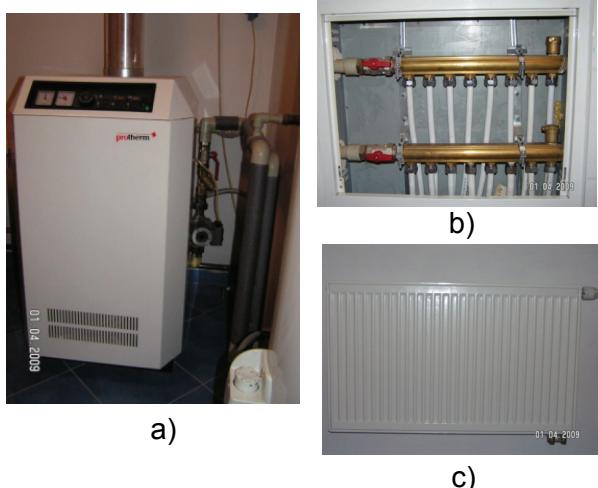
a) Gas boiler with circular pump, b) distributor unit, c) heat exchanger
